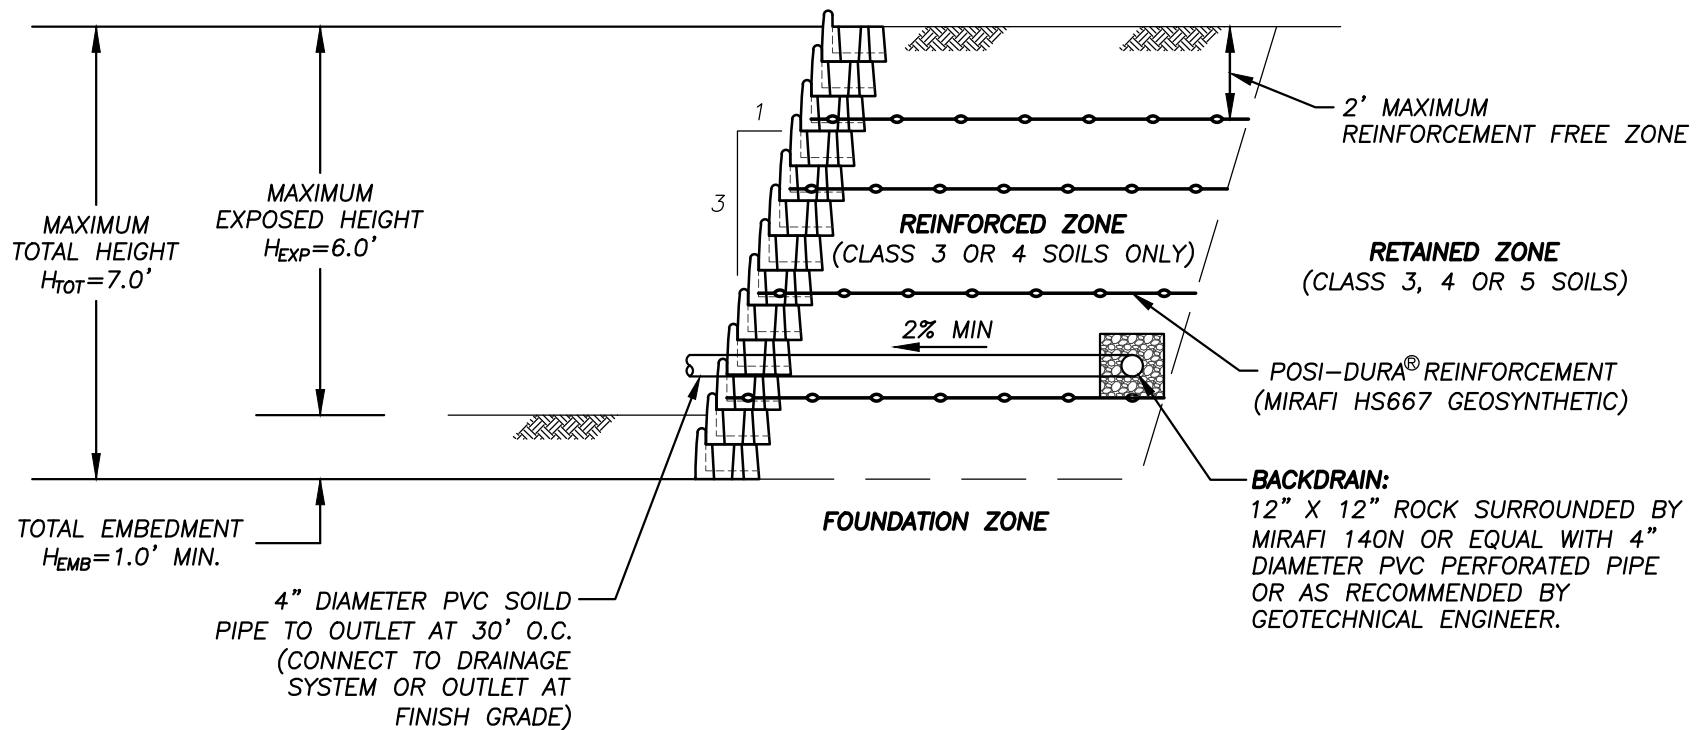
VERDURA RETAINING WALL WITH A VARYING SLOPE BELOW
